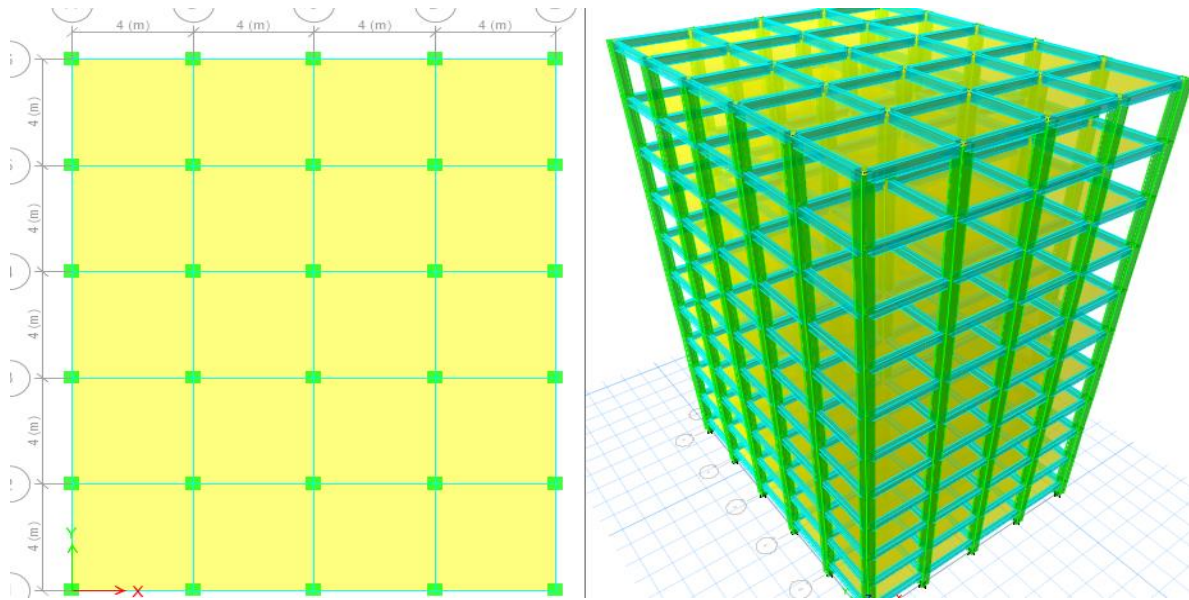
Plan and 3D view of Asymmetric Bare frame
